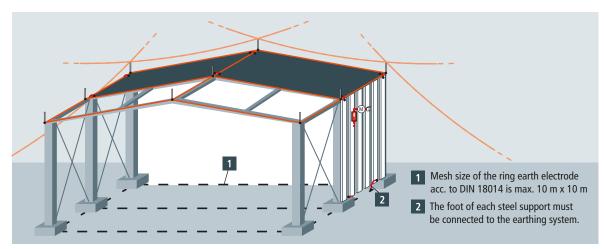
Steel hall with metal cladding and air-termination installed on the foil roof
